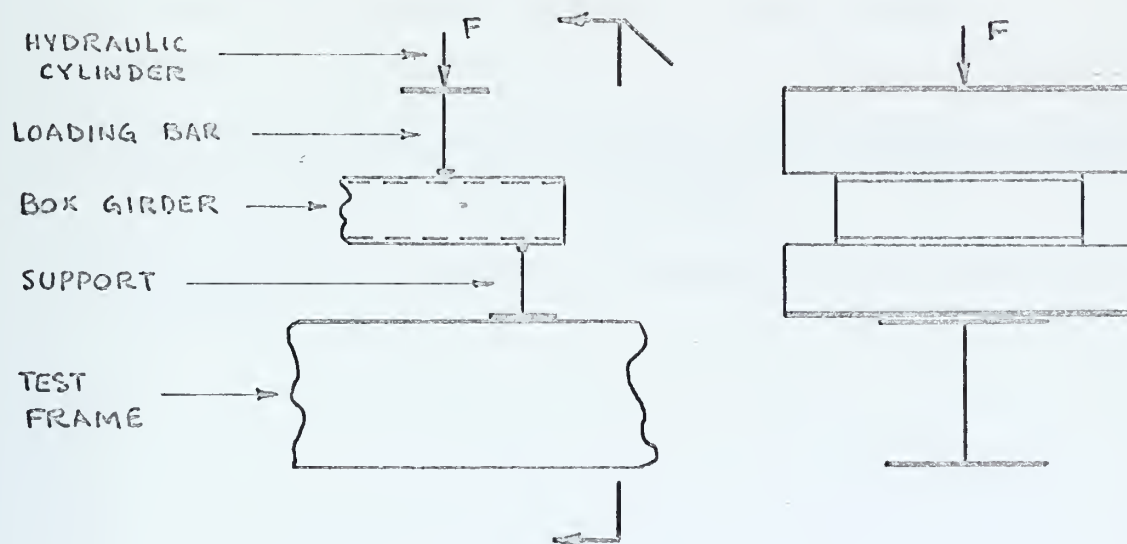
SCHEMATIC OF BENDING LOAD ON BOX GIRDER.
